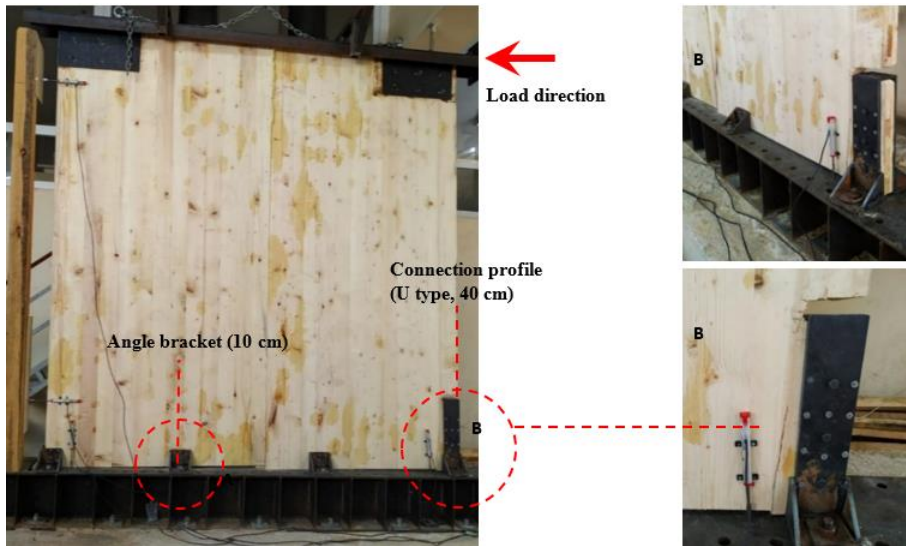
CLT wall to foundation Detail-1 and deformation of connections
